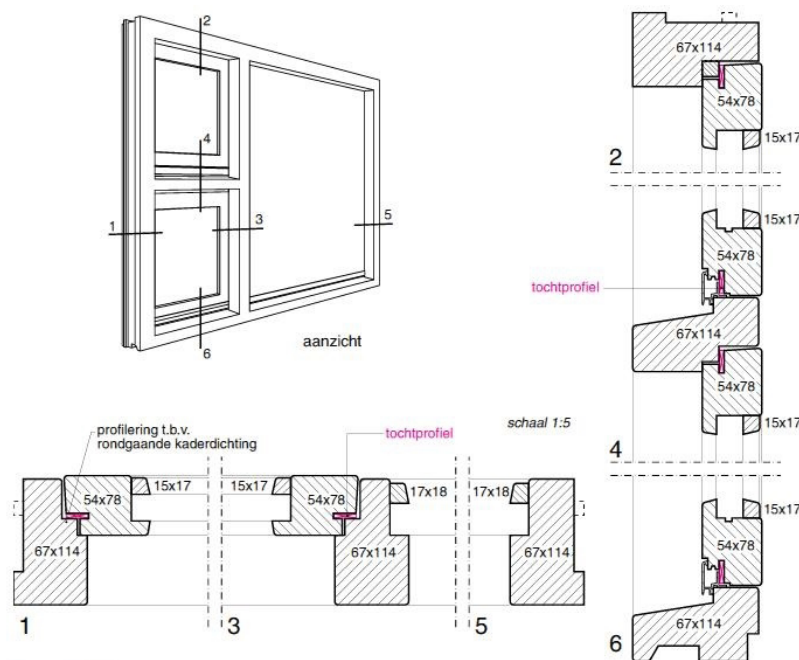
Window frame profiles (Geveltimmerwerk, n.d.)
